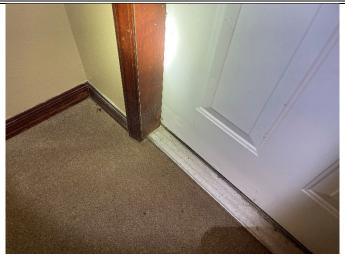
Water damage was observed at the base of the rear exit door trim.
